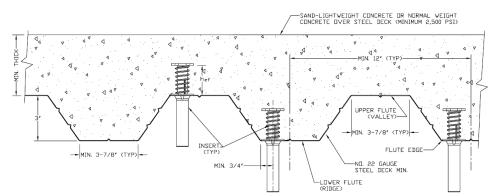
B—BANG-IT+ INSERTS INSTALLED IN SOFFIT OF CONCRETE FILLED STEEL DECK FLOOR AND ROOF ASSEMBLIES<sup>1,2,3,5,6,7</sup>
